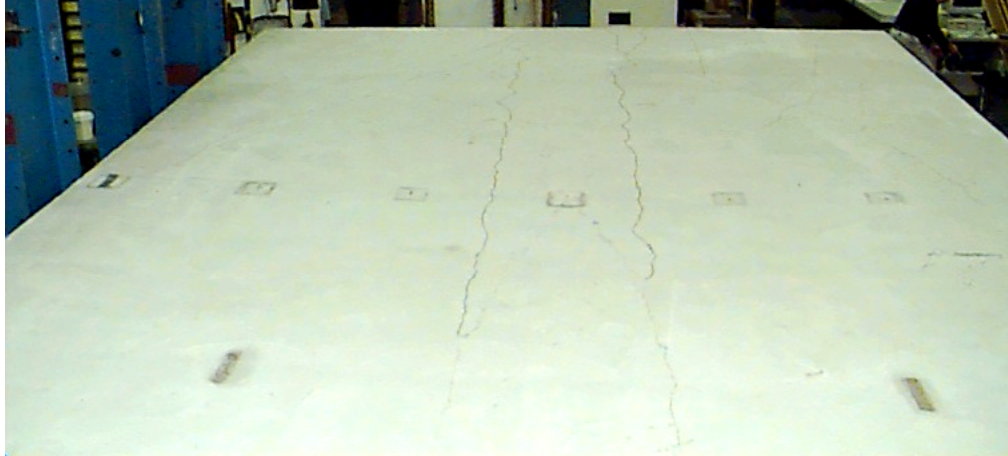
East End Slab Cracking Over IG/EB (FF-2)
